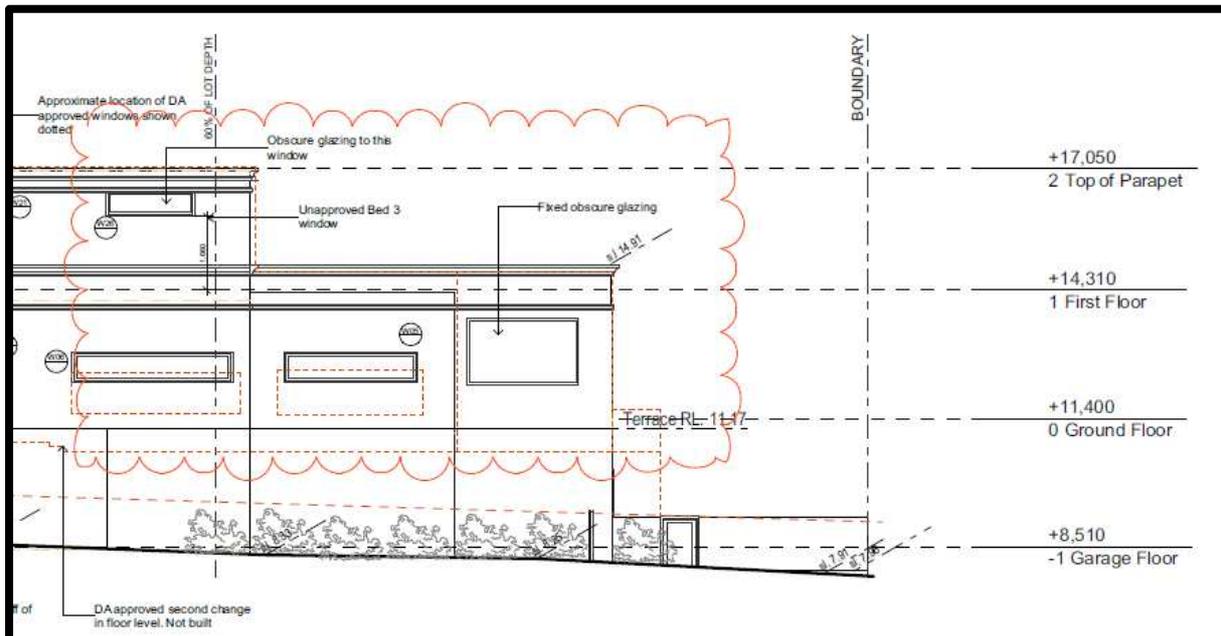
Extract of amended south side elevation (Source: Gelder Architects, August 19).
